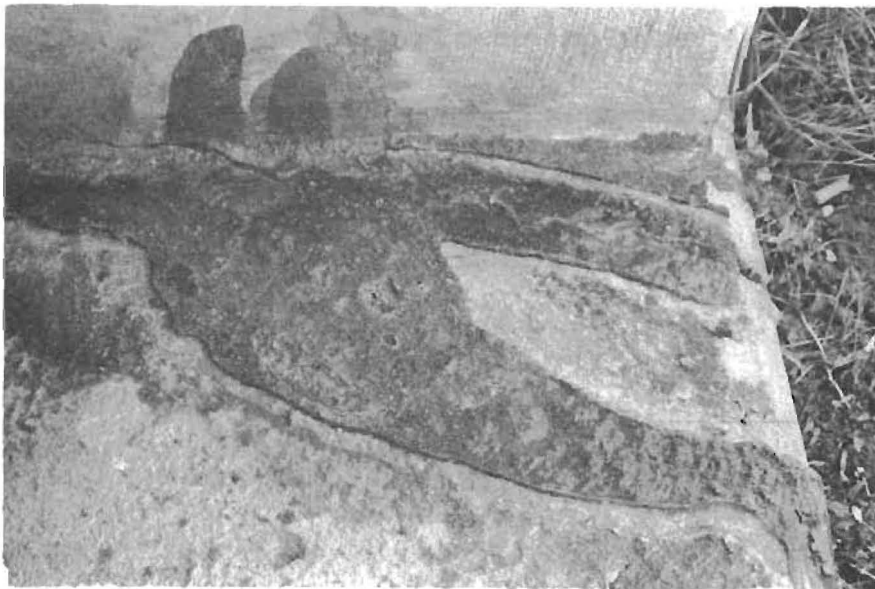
THE WEST ABUTMENT OF BRIDGE S44-750
